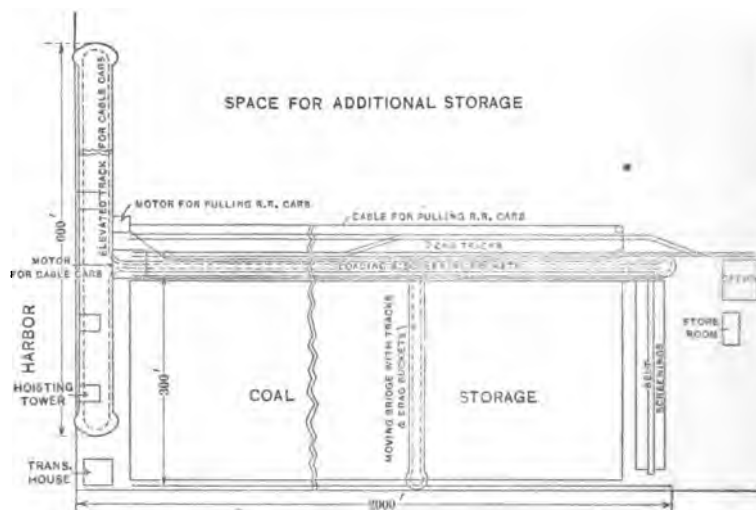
A—ARRANGEMENT OF DOCK FOR CABLE CAR EQUIPMENT.
